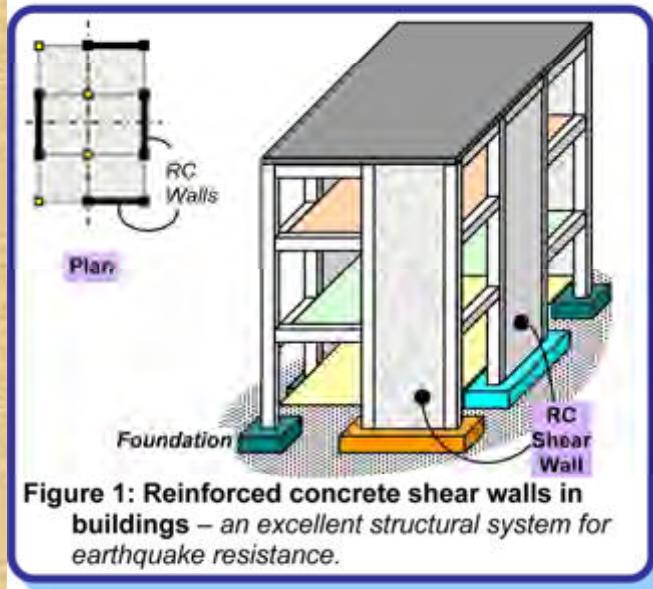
Reinforced concrete shear walls in buildings – an excellent structural system for earthquake resistance.
